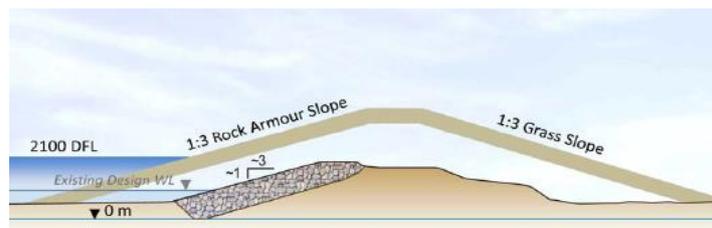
4. Typical Cross Section of Sea Dike (Source: (Ministry of Environment of British Columbia, 2003))
